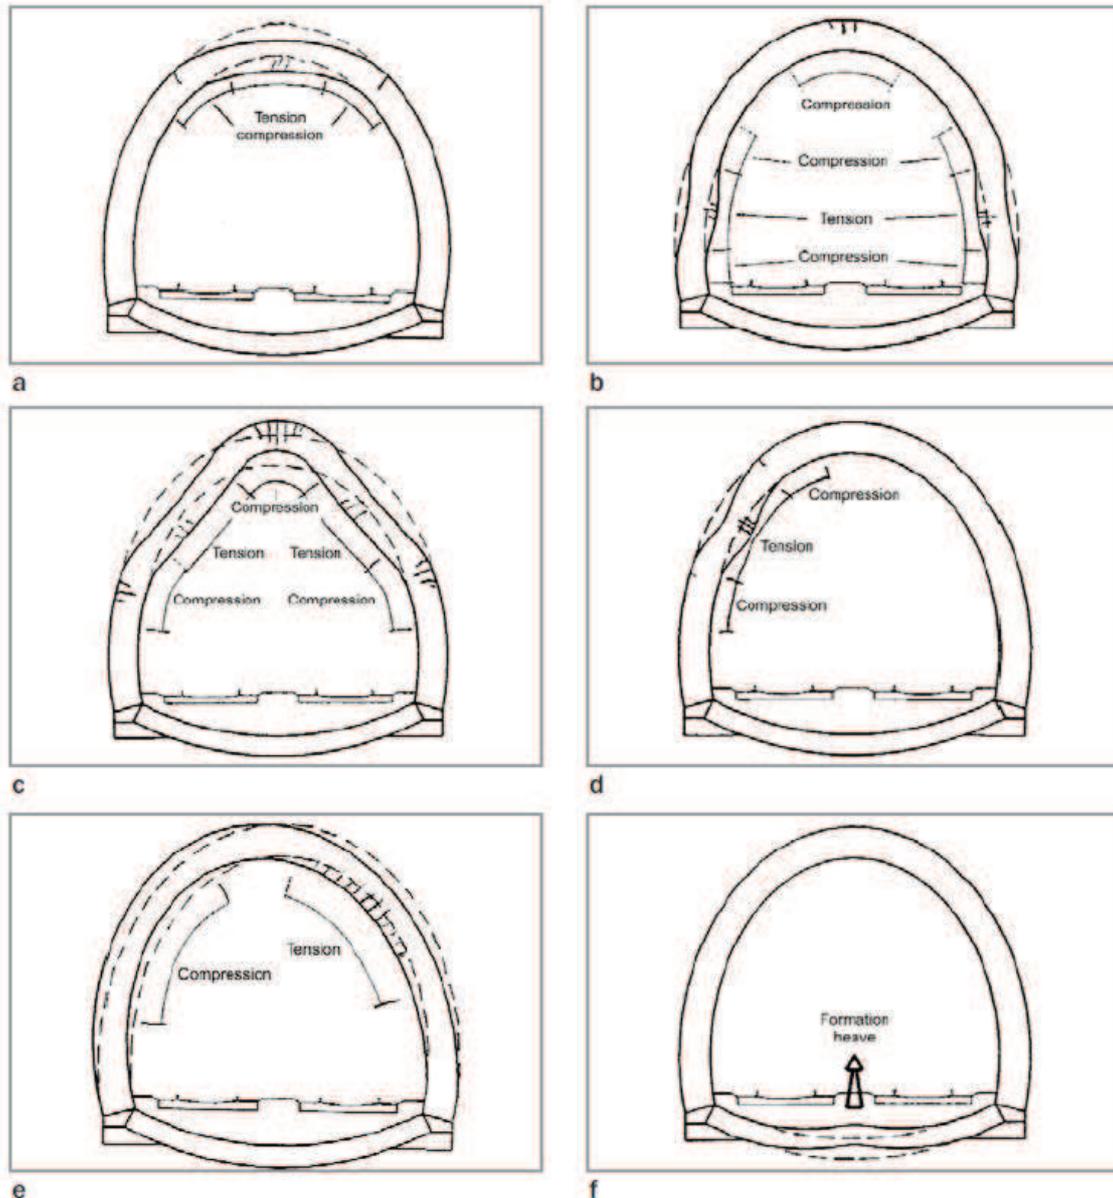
Typical forms of lining deformation in brick-lined tunnels [1]
